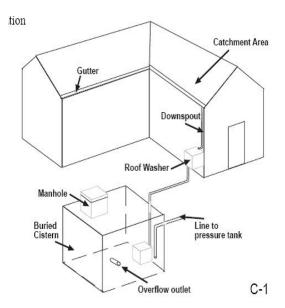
Rainwater Harvesting System (Source: Rupp, 1998)
